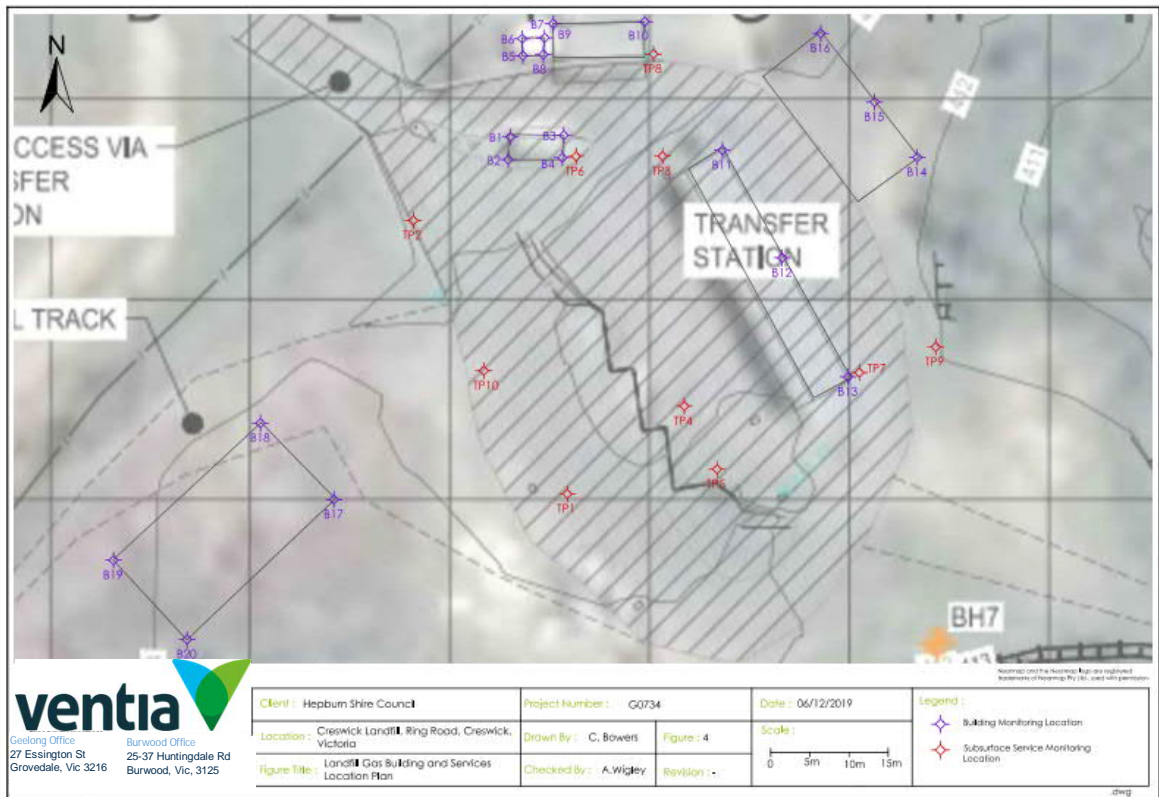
Buildings and Service Pits Gas Monitoring Locations
